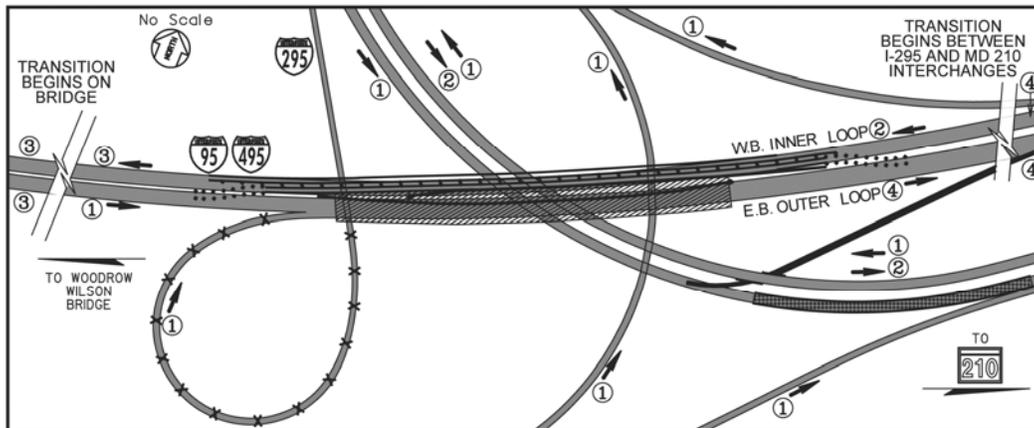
Woodrow Wilson Bridge Construction Diagram
